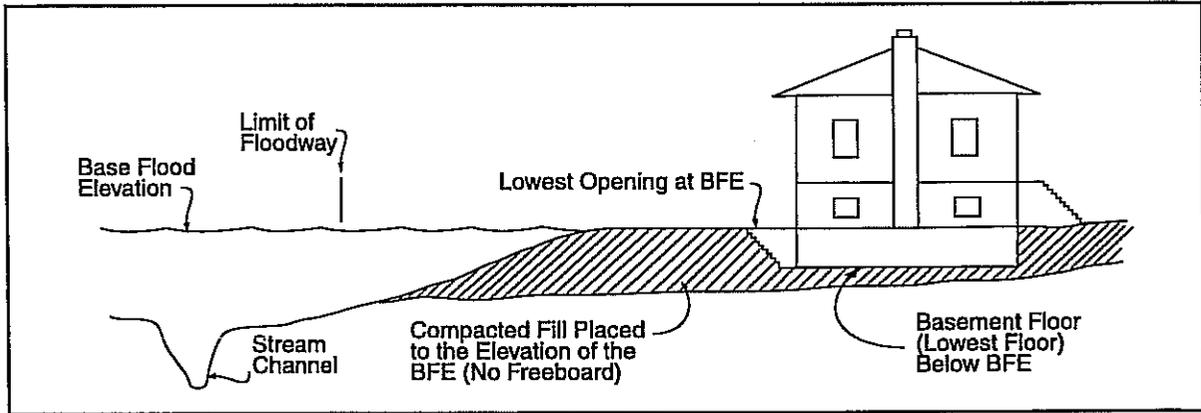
Basement foundation with lowest opening at the BFE. The basement is exposed to flooding from any flood greater than the Base Flood.
